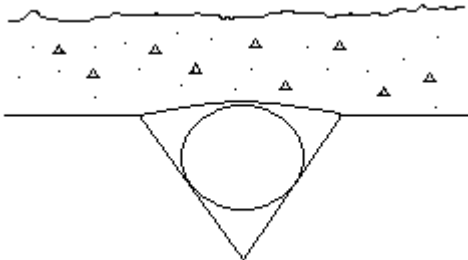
A wire is used instead of the string, the wire cross-sectional area is chosen so that it sits roughly flush with the pipe outside wall.
